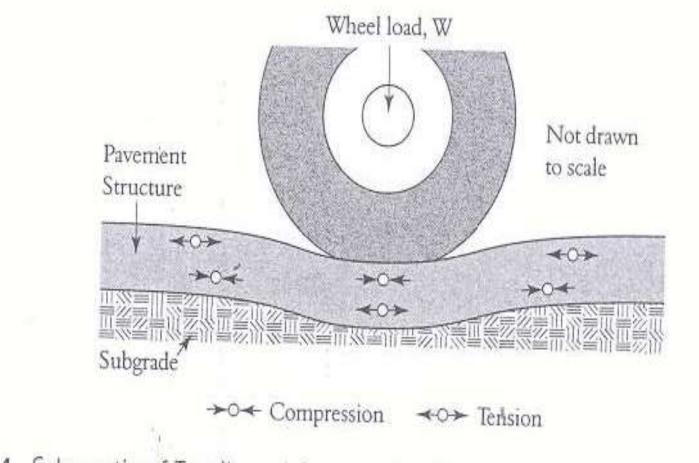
Schematic of Tensile and Compressive Stresses in Pavement Structure
